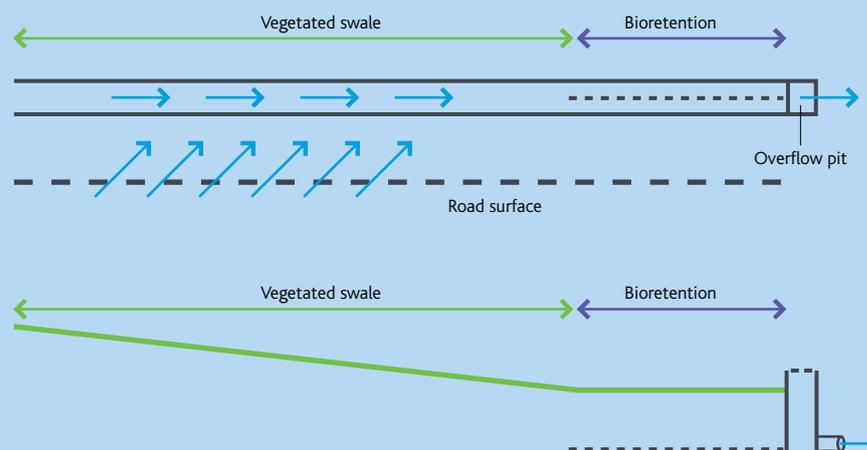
typical swale raingarden system adjacent to roadside – plan and section drawing
